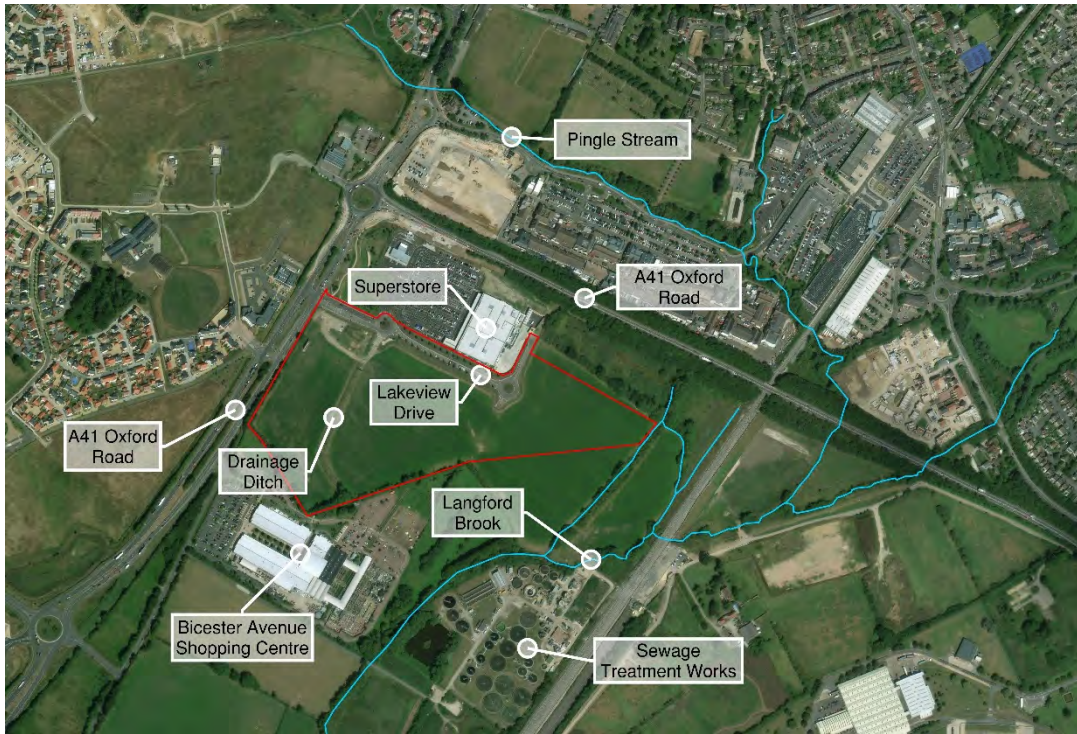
Site Location Plan with indicative red line boundary (Site Aerial received from Hyland Edgar Driver on 26/5/2017)
